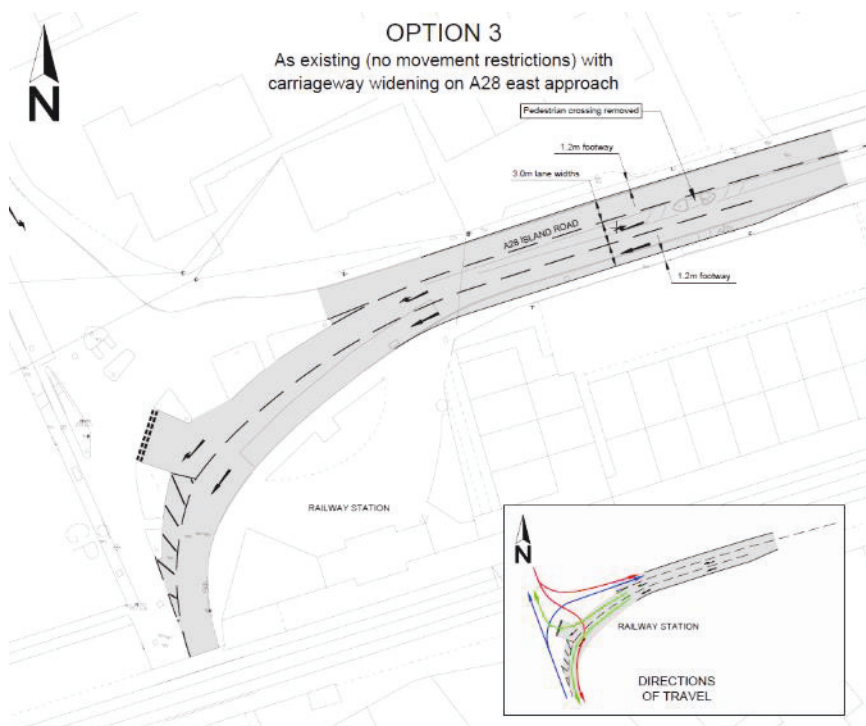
Option 3 for the Proposed Road Layout North of Sturry Level Crossing
